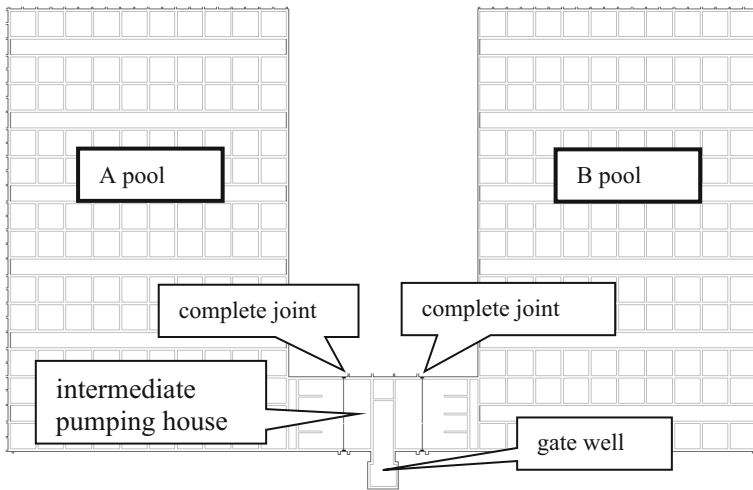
The layout plan of four tanks of a wastewater treatment plant.
